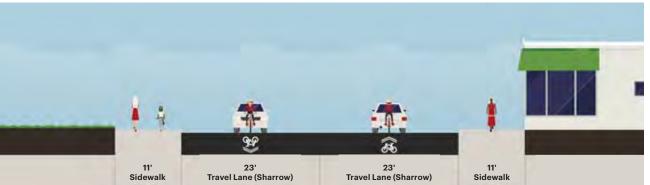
(Above) Key map of street section location Figure 6.28 (Left) Street sections
